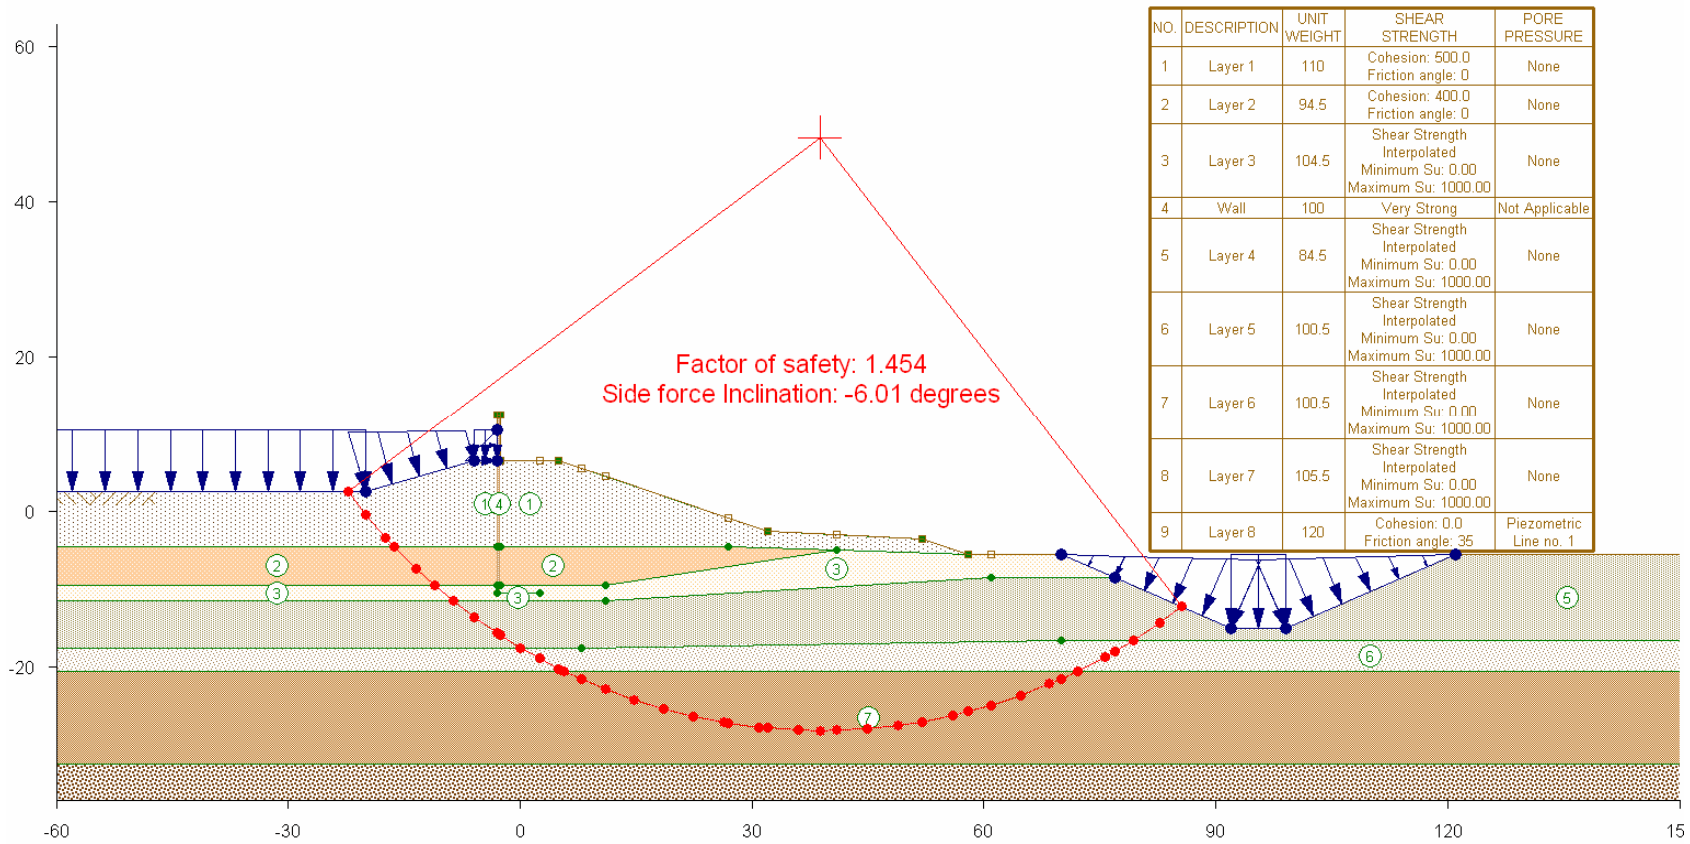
IHNC – East Bank (GDM Stability Plate), Case 1, Canal Water Level = Design - 10.5 ft (NAVD 88), without Crack
